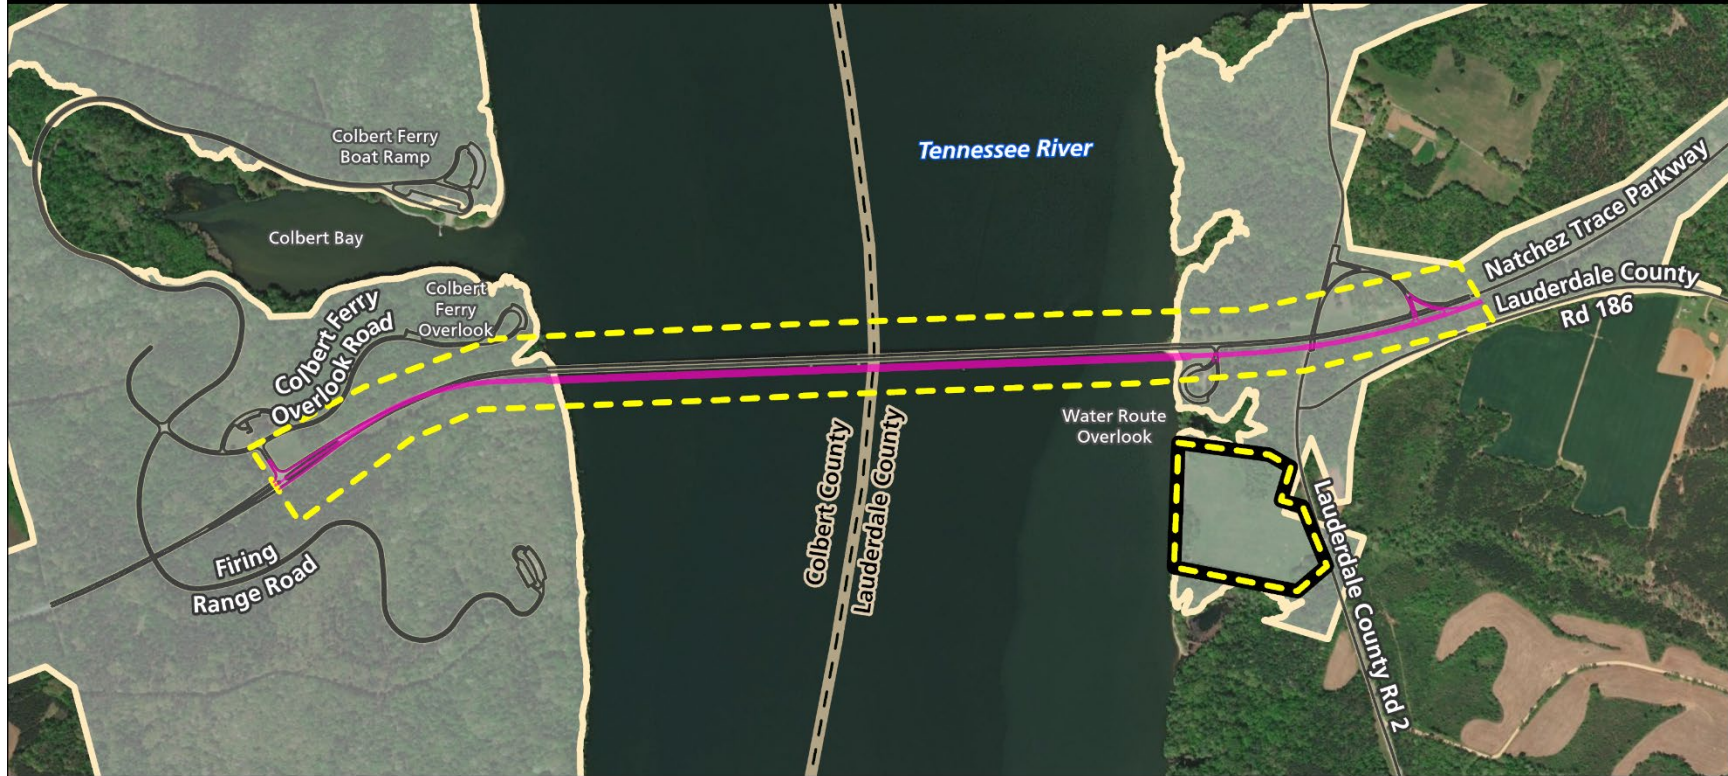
ALTERNATIVE 1 - REPLACE BRIDGE ON A SKEWED ALIGNMENT PARTIALLY SOUTH OF THE EXISTING BRIDGE
